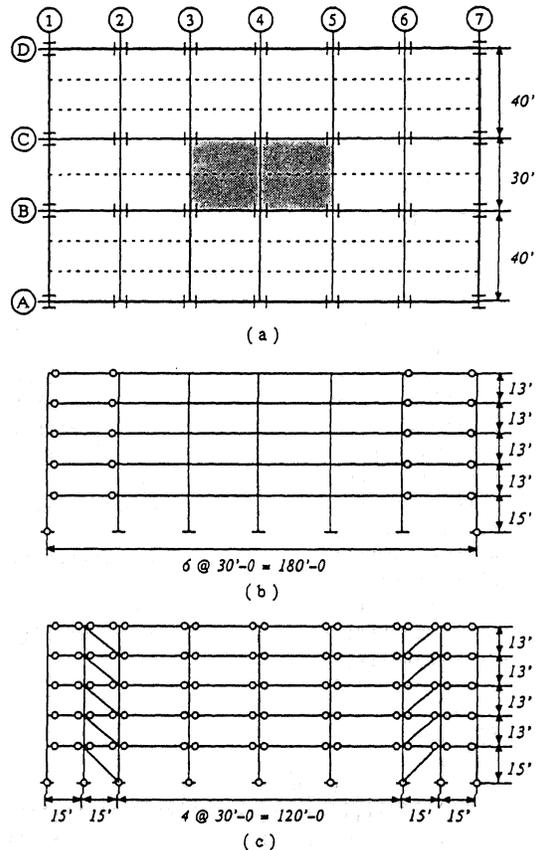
(a) Plan view of building. (b) Elevation of SMRSF and OMRSF. (c) Elevation view of CBF.
